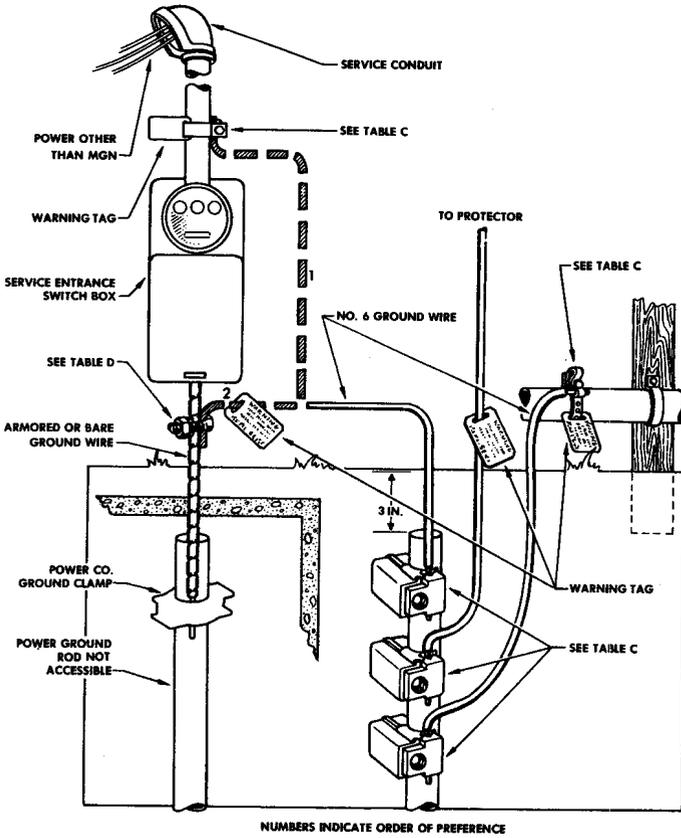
Power Other than MGN Grounded to Inaccessible Ground Rod—Unacceptable Interior Water Pipe
